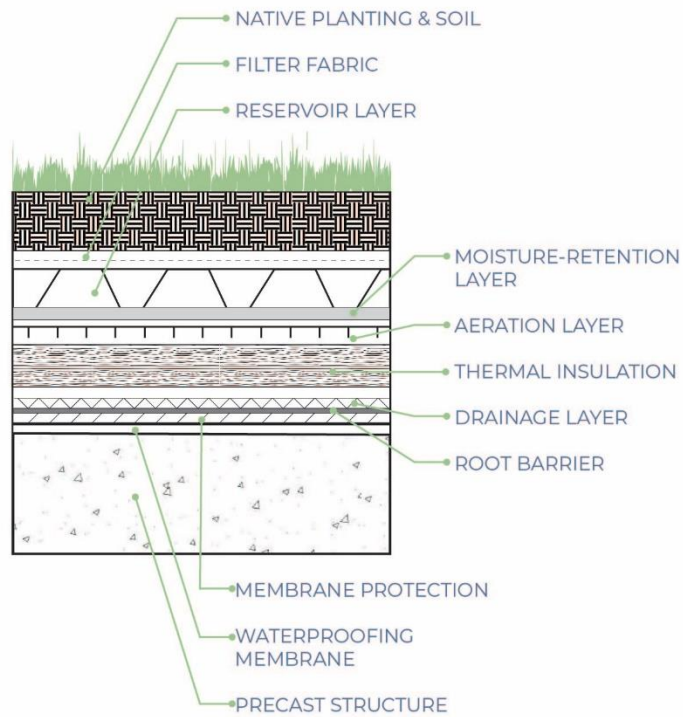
Green Roof Detail (modeled by Anne Manstrom, 2024)
